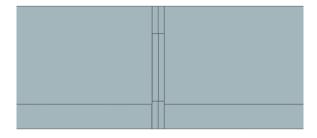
Front view of a Horizontal Joint – Hidden brackets
